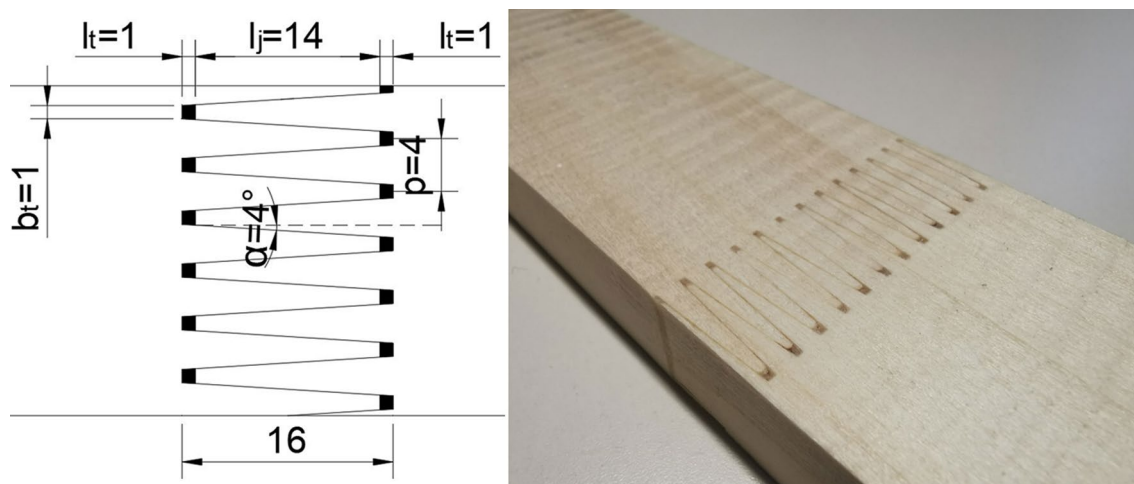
Geometrical parameters of the finger joint profile and finger joint picture. Dimensions in mm
